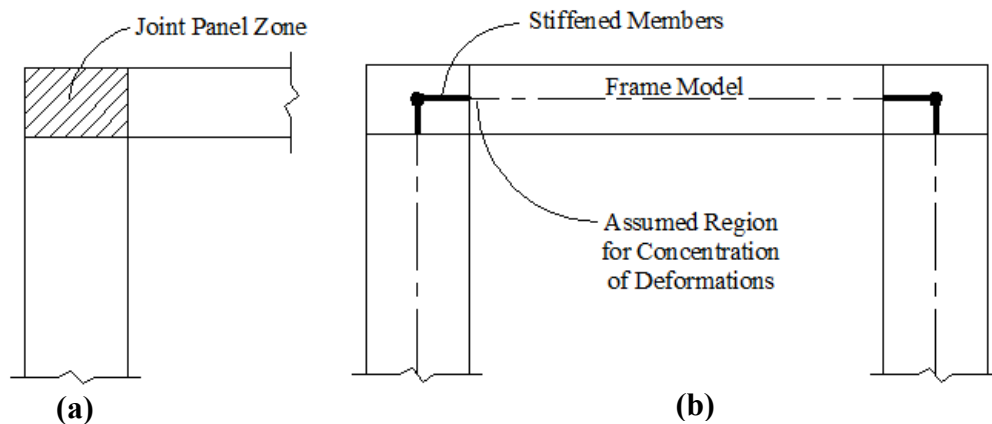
(a) A Beam-Column Connection; (b) Frame Model of a Structure Consisting of 1D Frame Members
